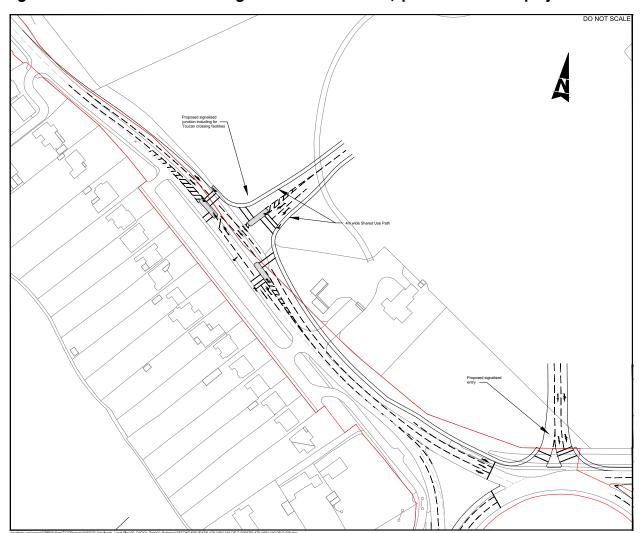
Indicative access arrangement for Thickthorn (Spine road and employment site access)
